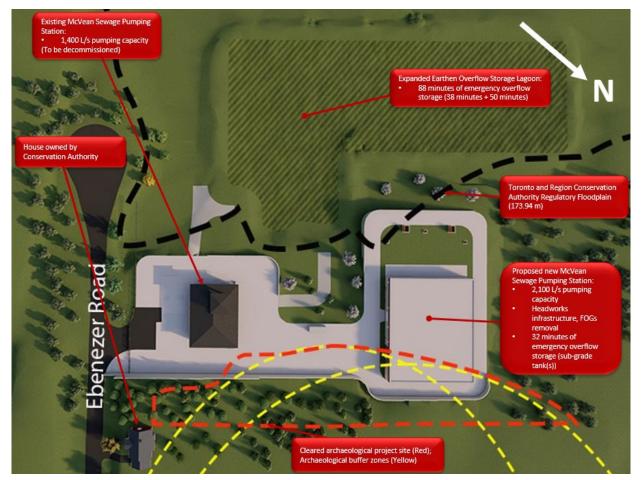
Alternative 3 Layout – New SPS and Expansion of Existing Earthen Emergency Overflow Lagoon
